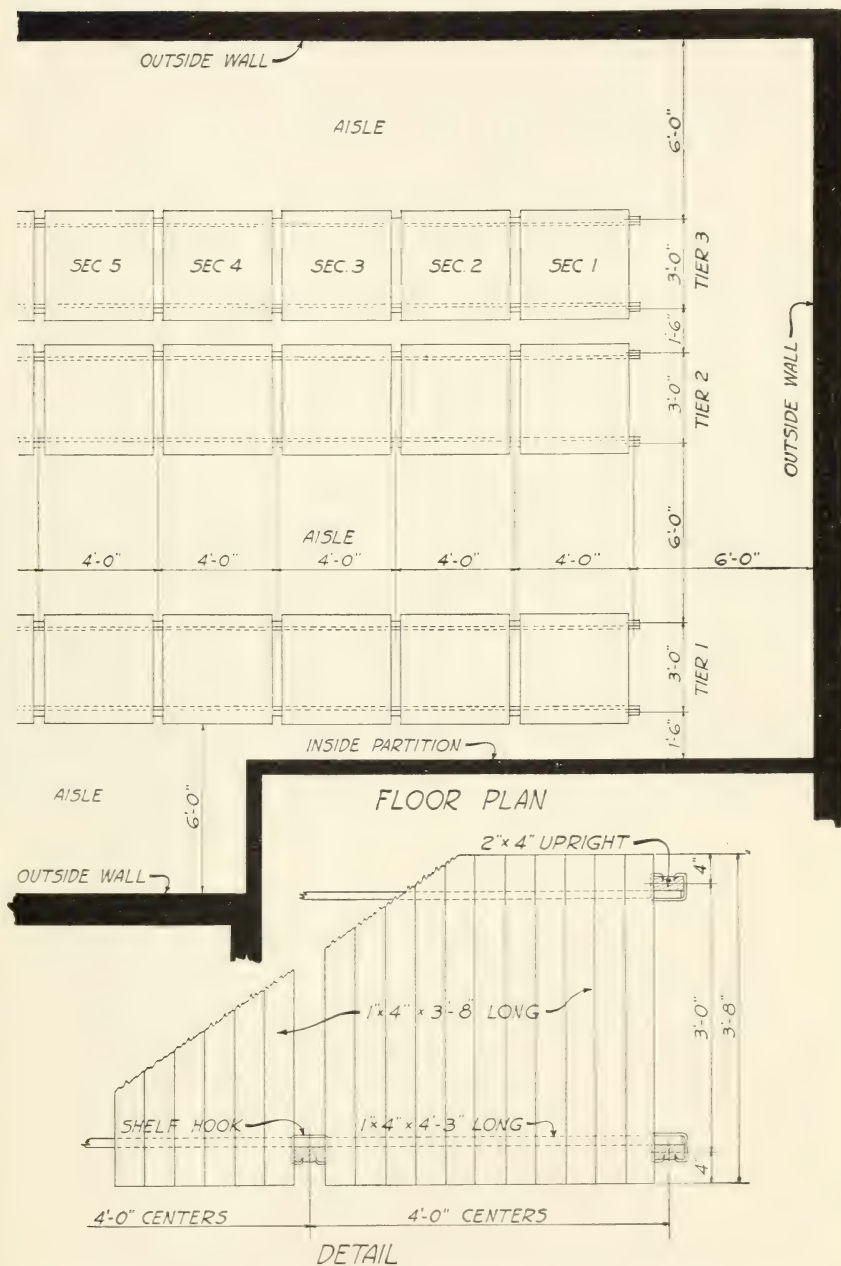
Floor plan of an inside storage room for nursery stock.
